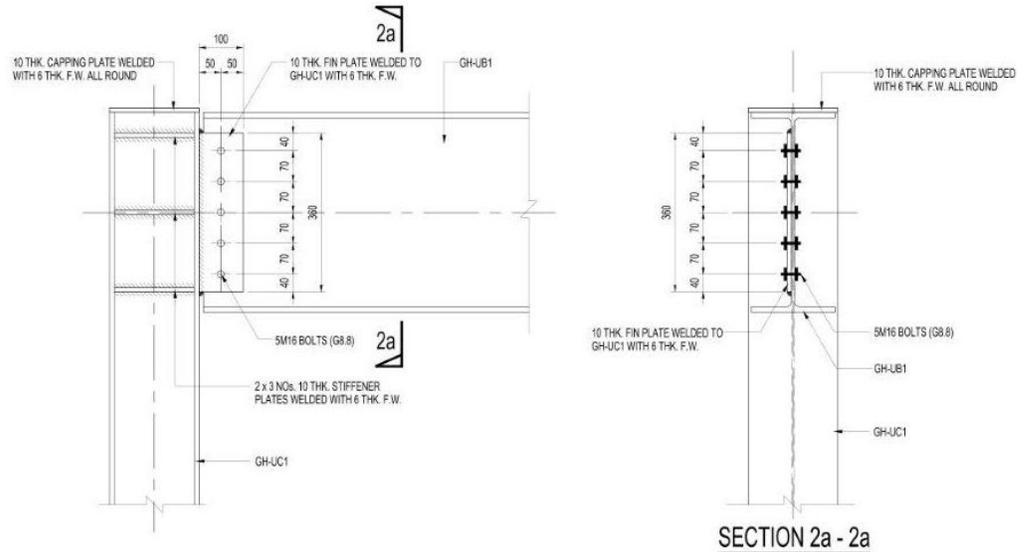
Structural Steel Connections (Image courtesy of RSP)
